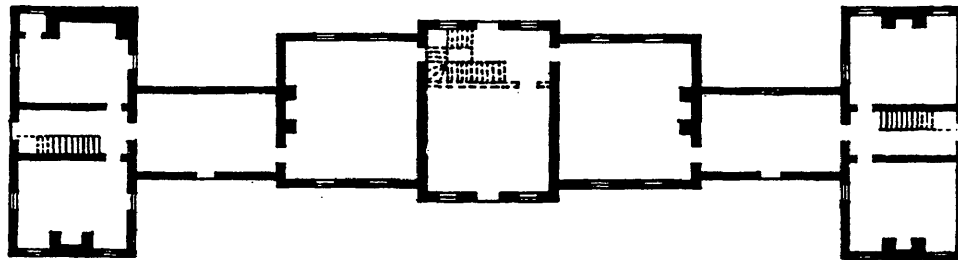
BATTERSEA, GROUND FLOOR PLAN
